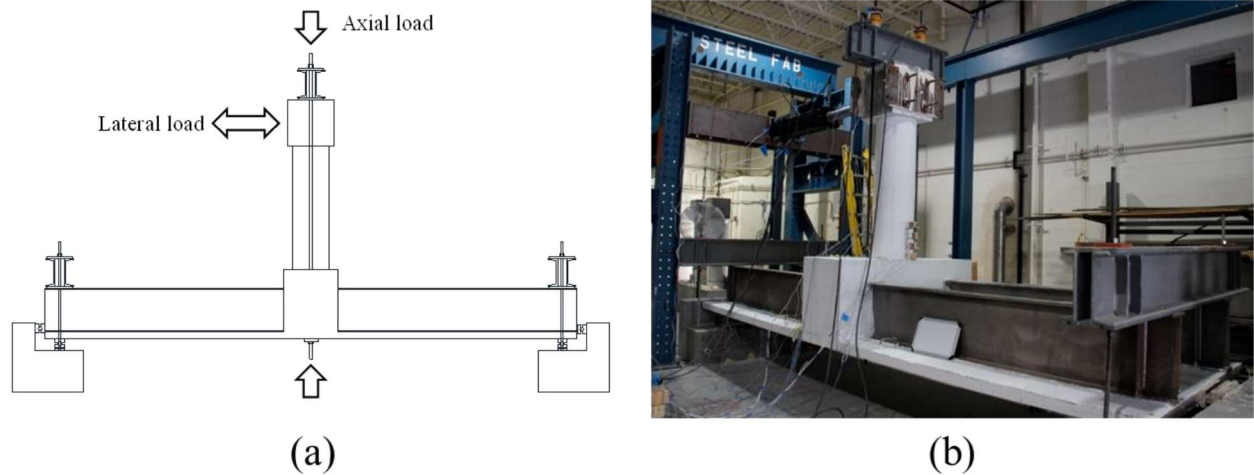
(a) Test setup simulating the actual structural behavior, (b) SDCL test specimen constructed in FIU structures lab.
